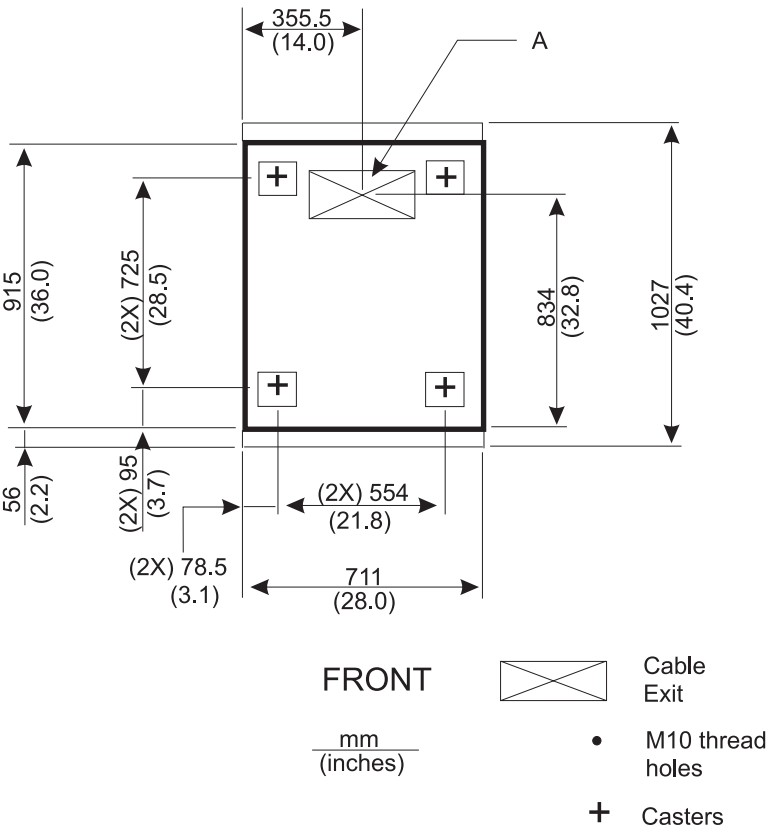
Floor cutout dimensions for the 1.25 m (49 in.) frame
